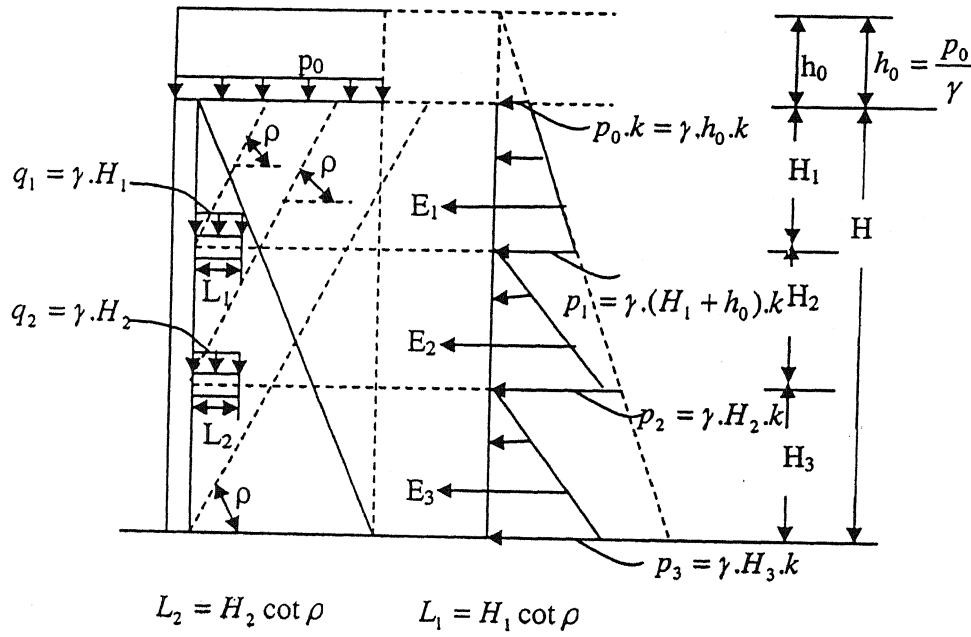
Counterforted wall with relief shelves (uniform surcharge and unreinforced sand backfill)
